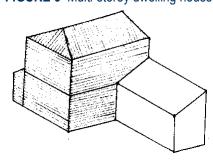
Multi-storey dwelling houses. Principal building form shown hatched.
